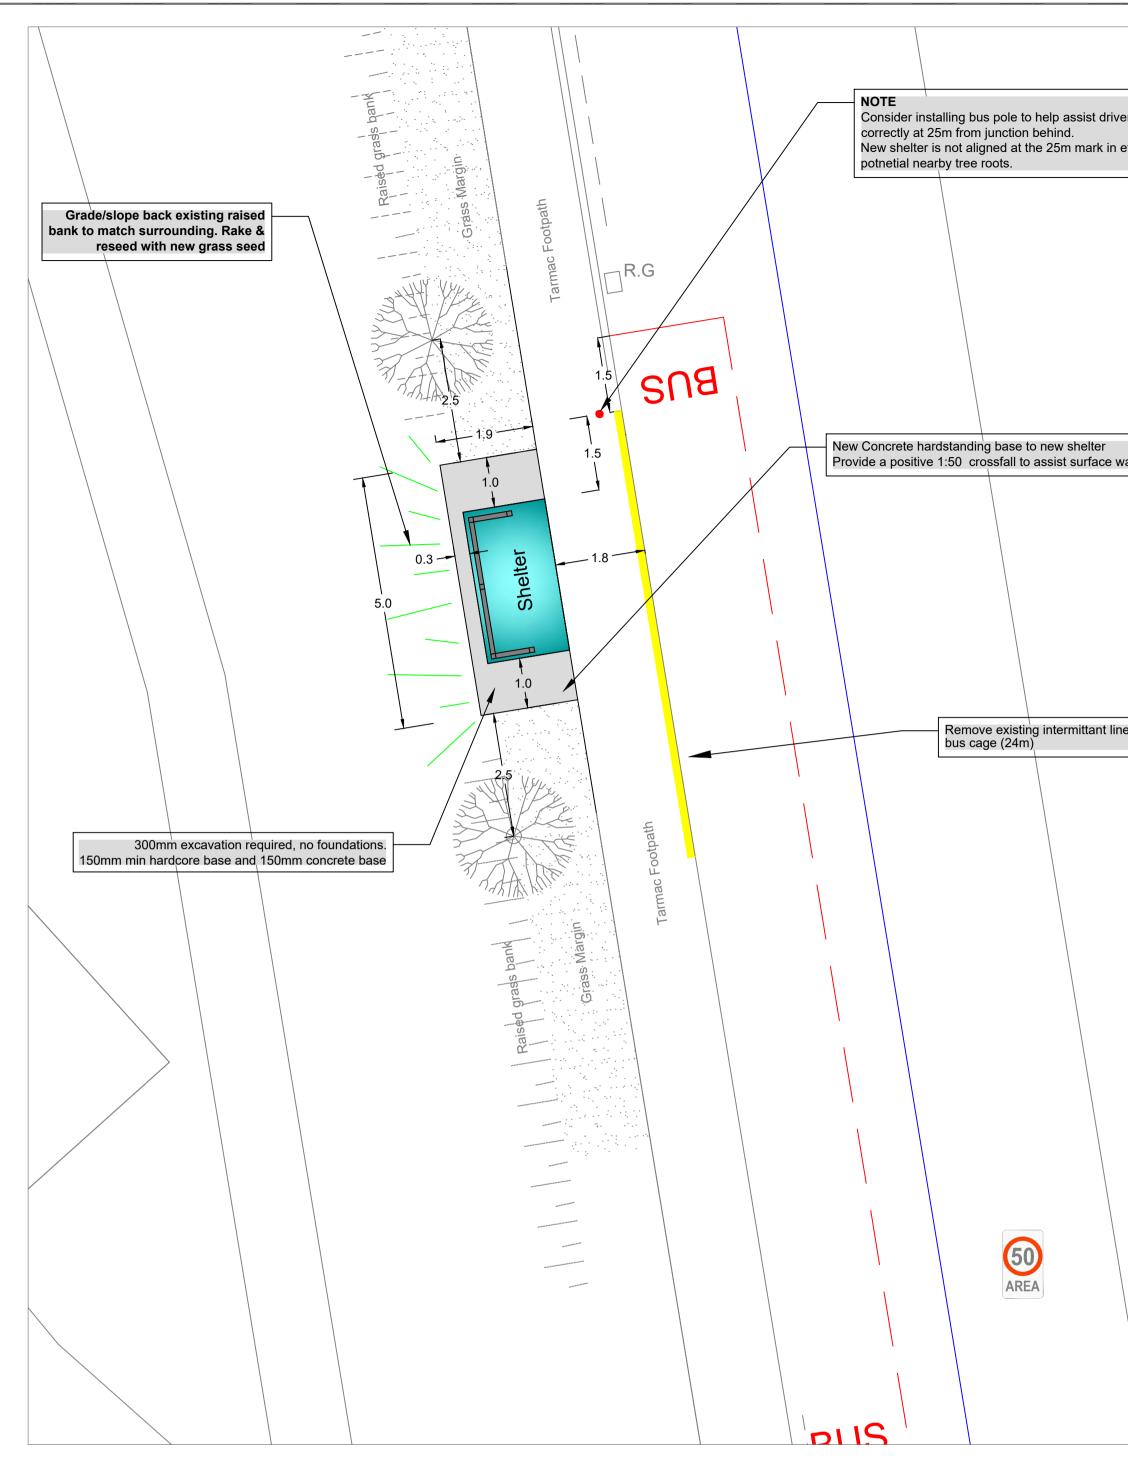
Layout Plan(2) Proposed new Bus Shelter/Boarding platform
